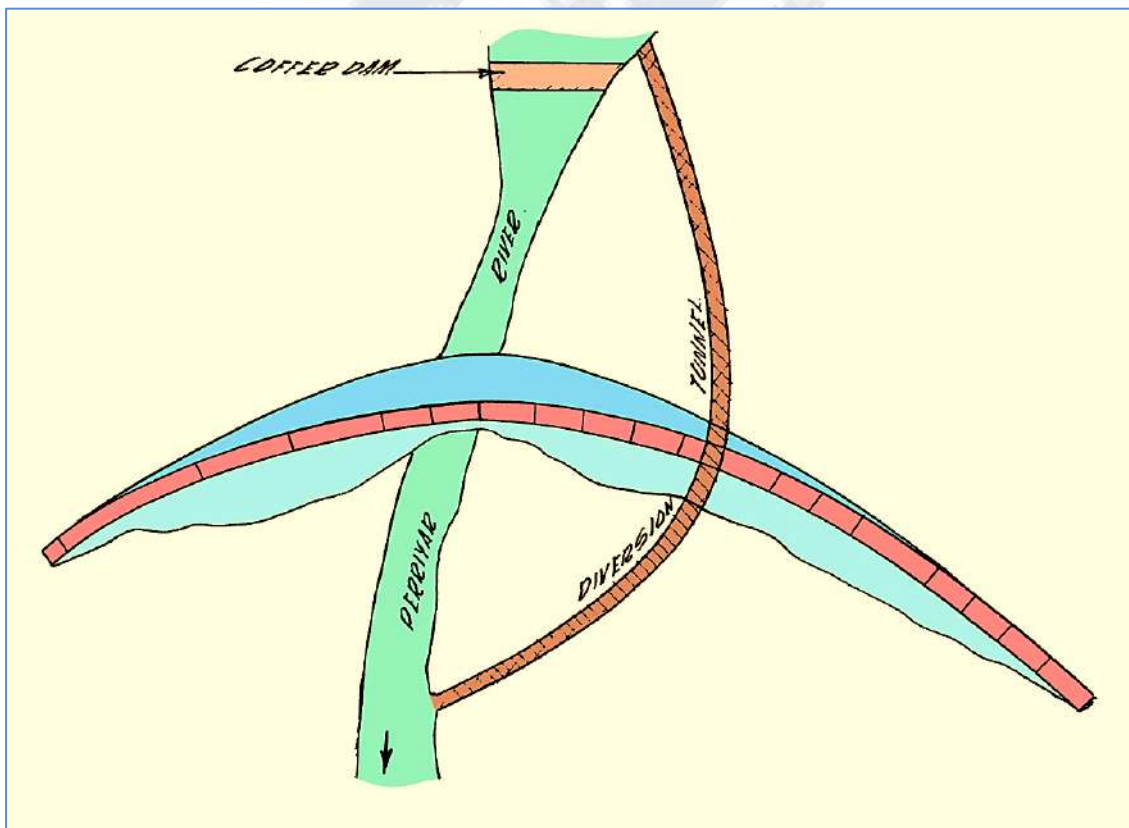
Idukki Dam Diversion Tunnel Layout
